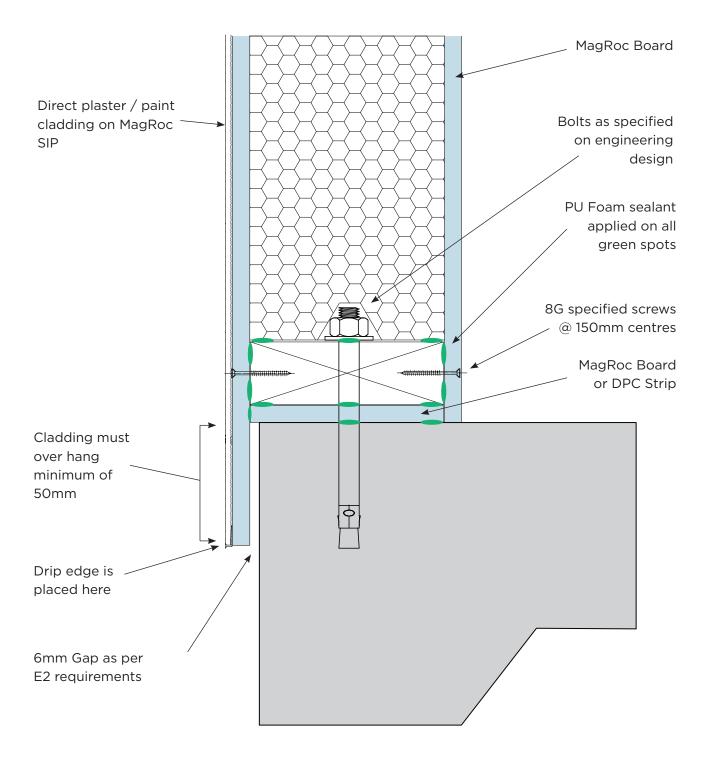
MagRoc 'Typical' Floor Detail -Bearing on the Slab with Cavity
